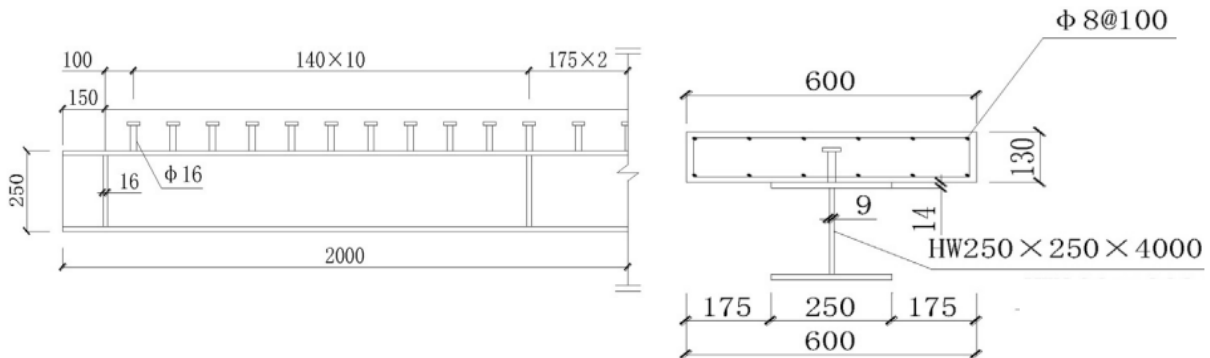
Layout of headed studs and cross section of FBST-1specimen (unit: mm) [16].
